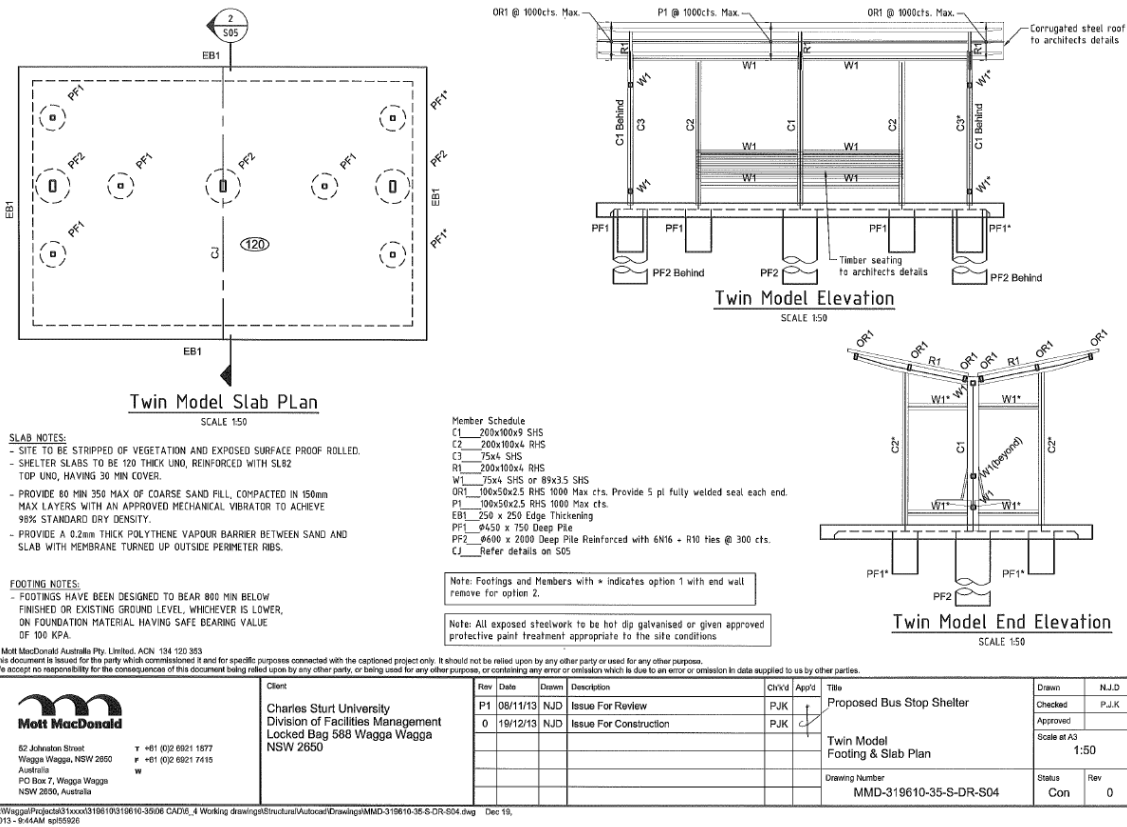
Bus Shelter Twin Model Footing and Slab Plan
